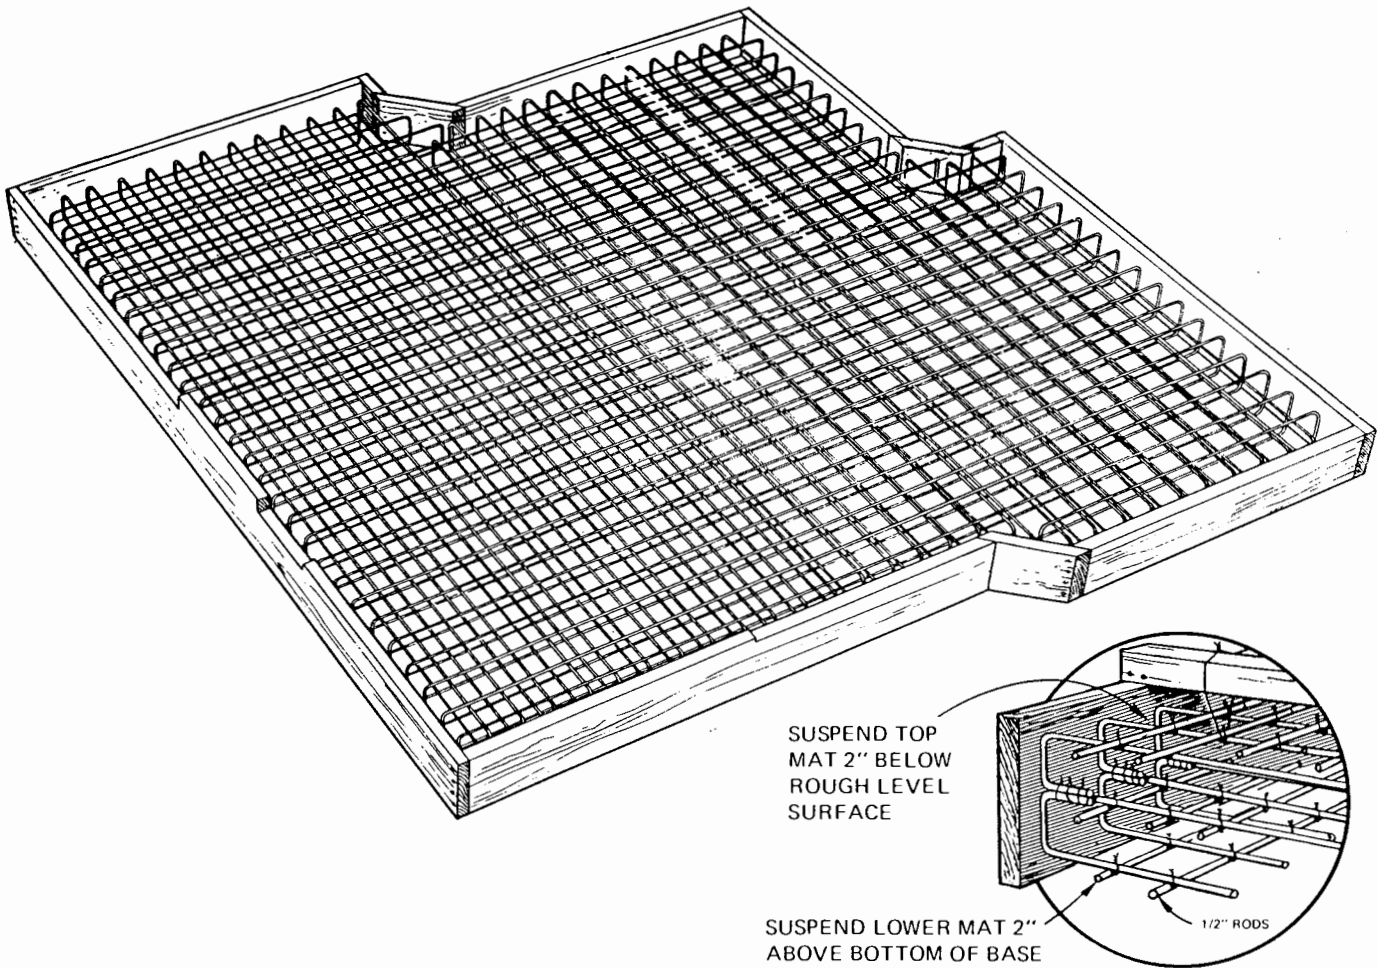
TYPICAL STEEL REINFORCING ROD ARRANGEMENT (Design By Others)
